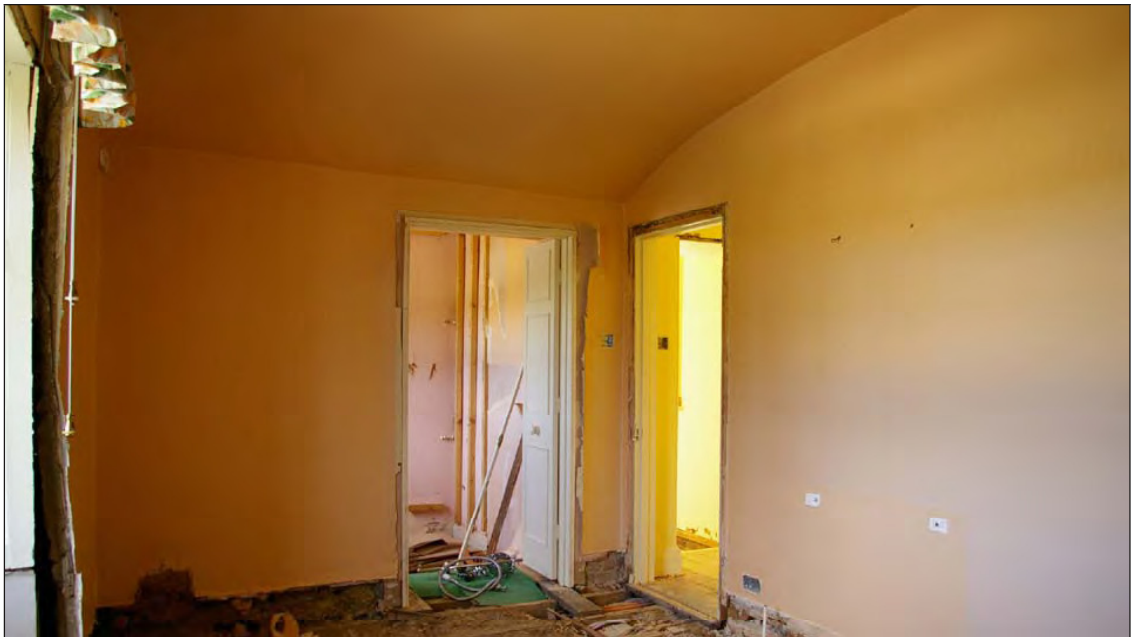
Room 5, viewed from the north-west. Note the curving ceiling.
